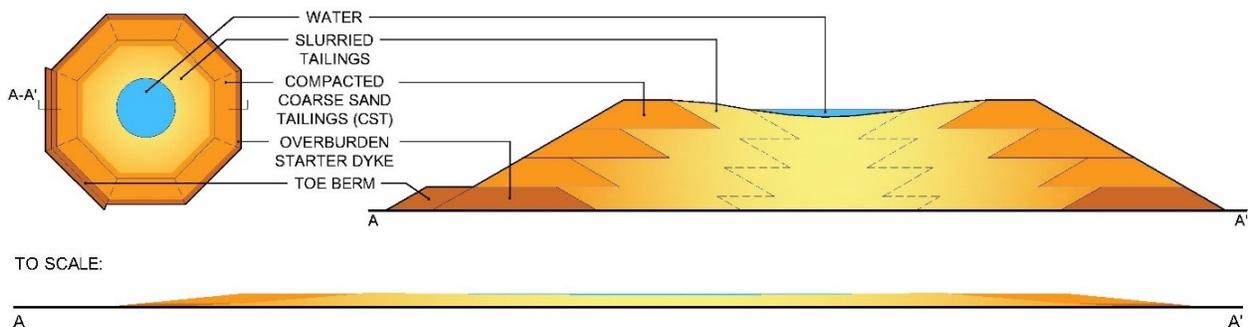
Fictional TSF in plan view (left) and section (right) at approximately 10x vertical exaggeration. Drawings not to scale. TSF cross section drawn to scale below.
